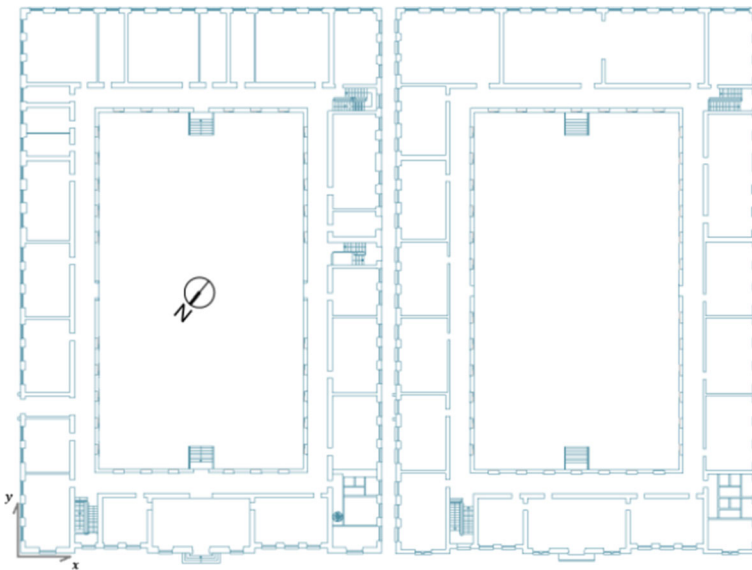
Main building of the Tomás Cabreira Secondary School—ground floor level (*left*); first floor level (*right*)
